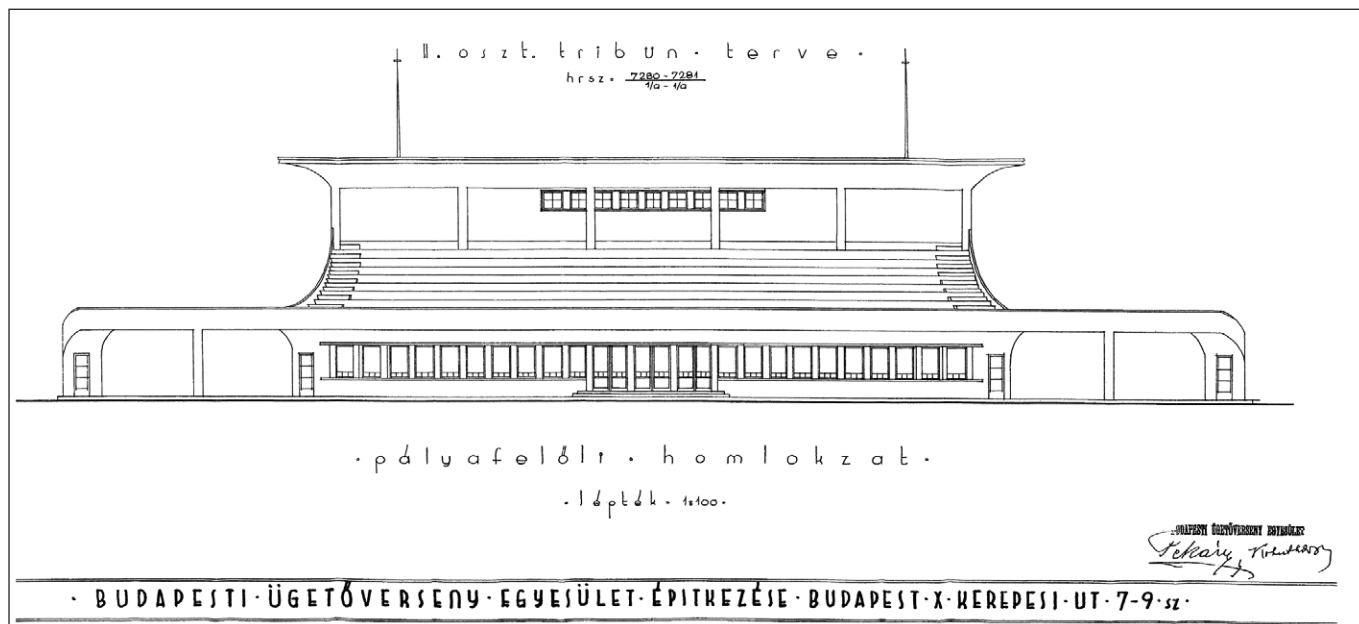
Front elevation of the Class II. Grandstand on the original plan from 1935
